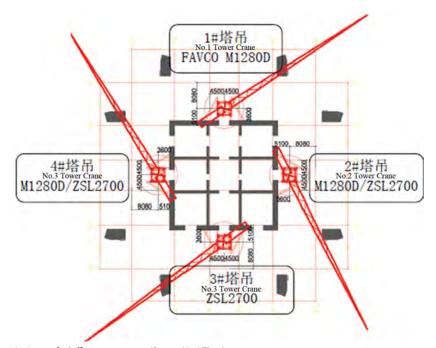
Layout for luffing tower cranes. (Source: Yuqi Zhou) 图6.21. 动臂塔吊位置示意图 (来源: 周予启)
